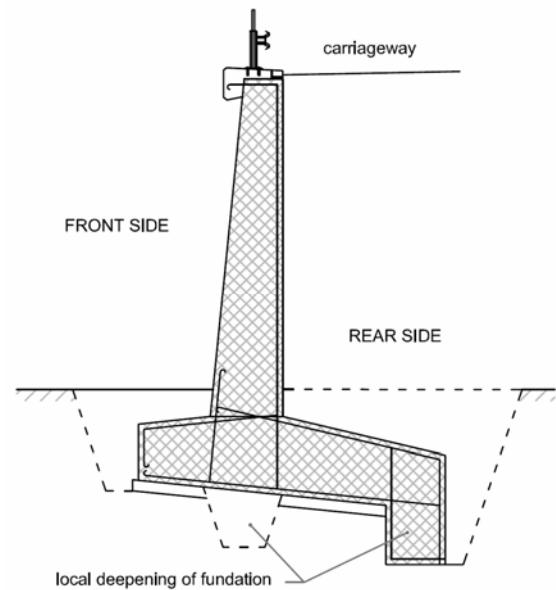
Some possibilities of foundation design to increase positive interaction between the wall and the ground
